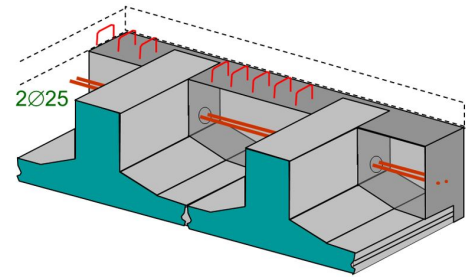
Crossbeam between the girders with reinforcement.[10]
